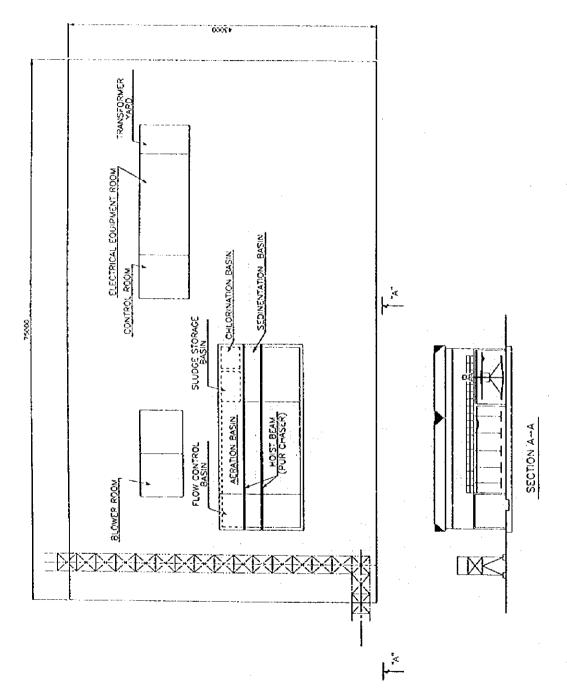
Layout of Live Sewerage Treatment Station
